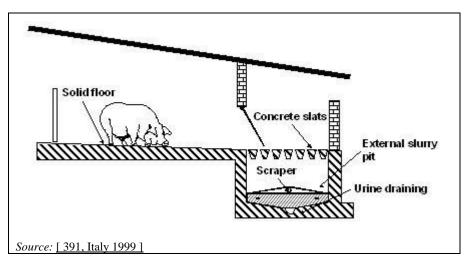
Solid concrete floor with slatted external alley and scraper underneath
